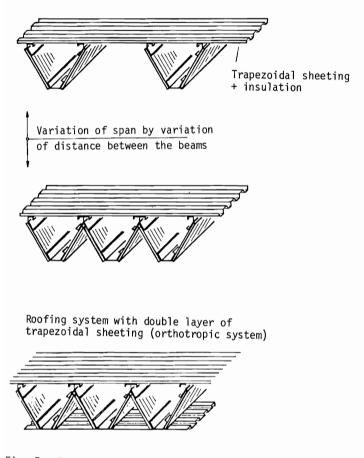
Research Project: V-shaped Beams of Trapezoidal Sheeting and Cold Formed Sections
